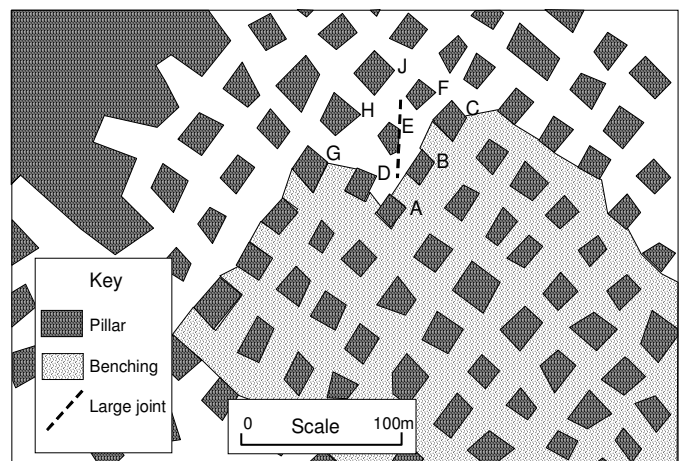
Plan view showing layout of pillars and bench mining at case study mine as modeled using the Examine 3D software.
